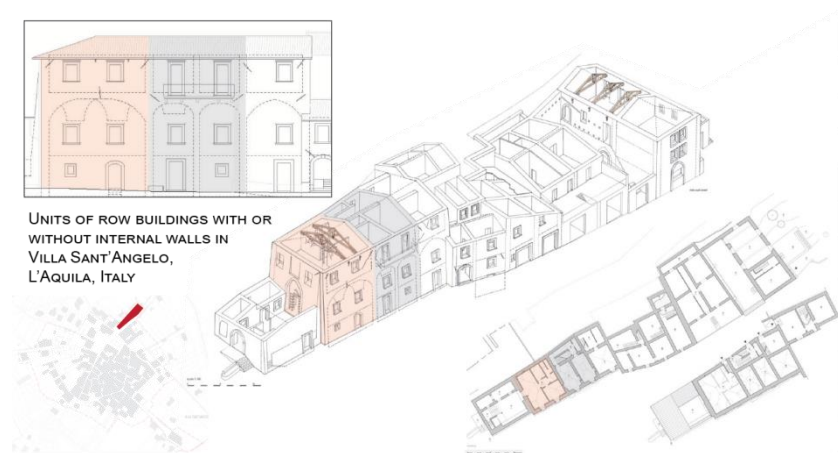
Plan views of the case study buildings and the corresponding façades (wall thickness refers to Case A).
